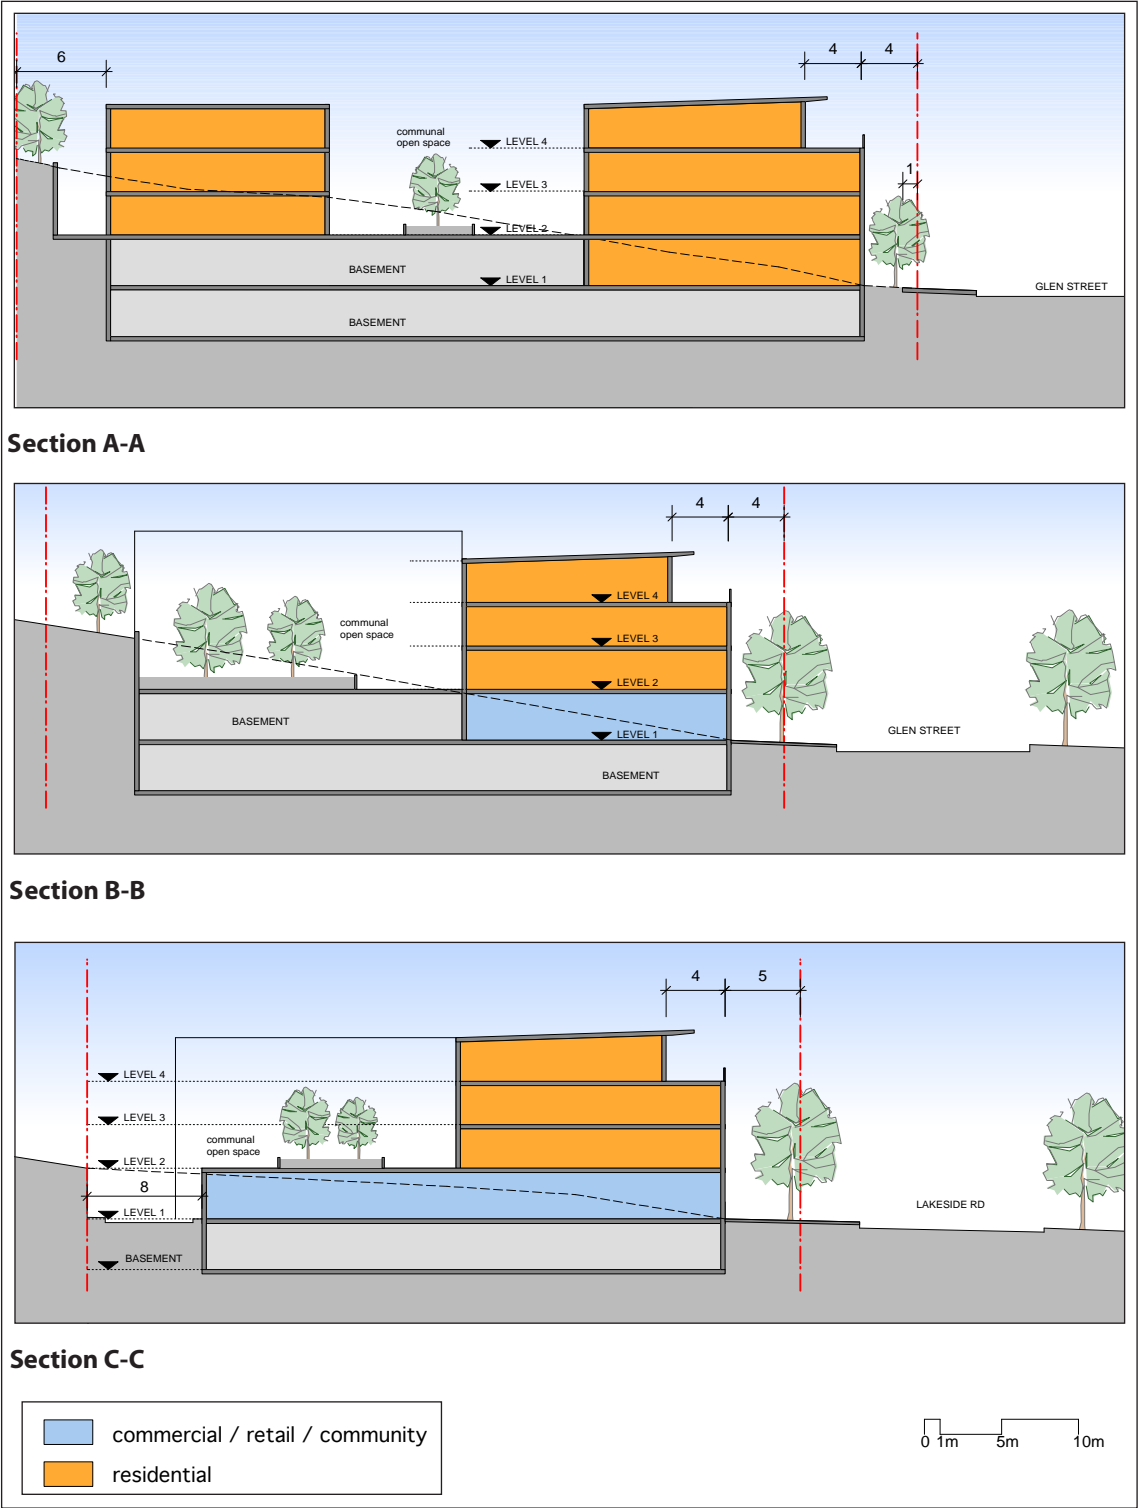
Glen Street and Lakeside Road Precinct Building Setback Controls Sections
